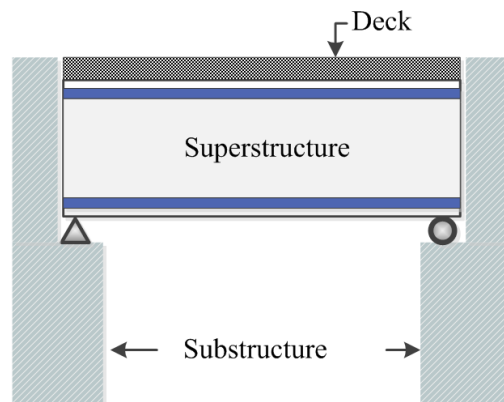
Bridge main elements (Deck, Superstructure and Substructure)
